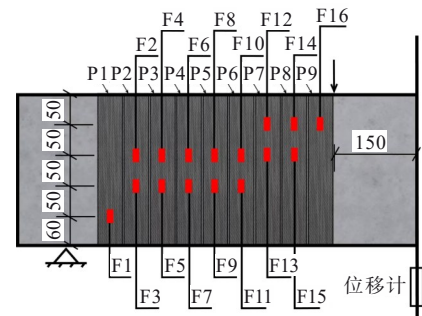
Control beam and CFRP-strengthened configurations (unit: mm)
